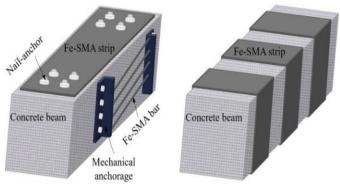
Illustration of Concrete Beams Reinforced with SMA Strips and Bars [39]
